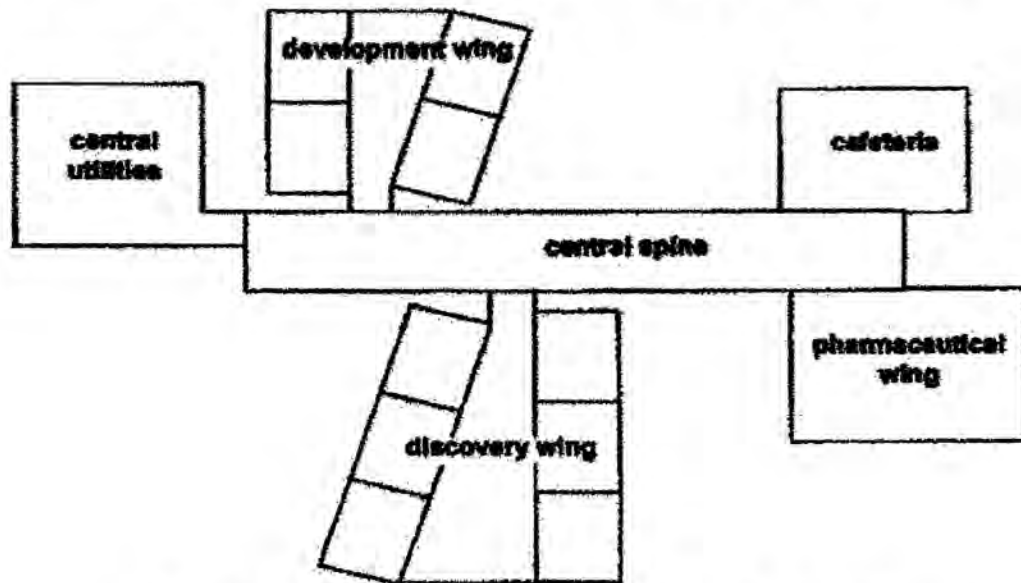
Schematic Site Plan of Proctor & Gamble
